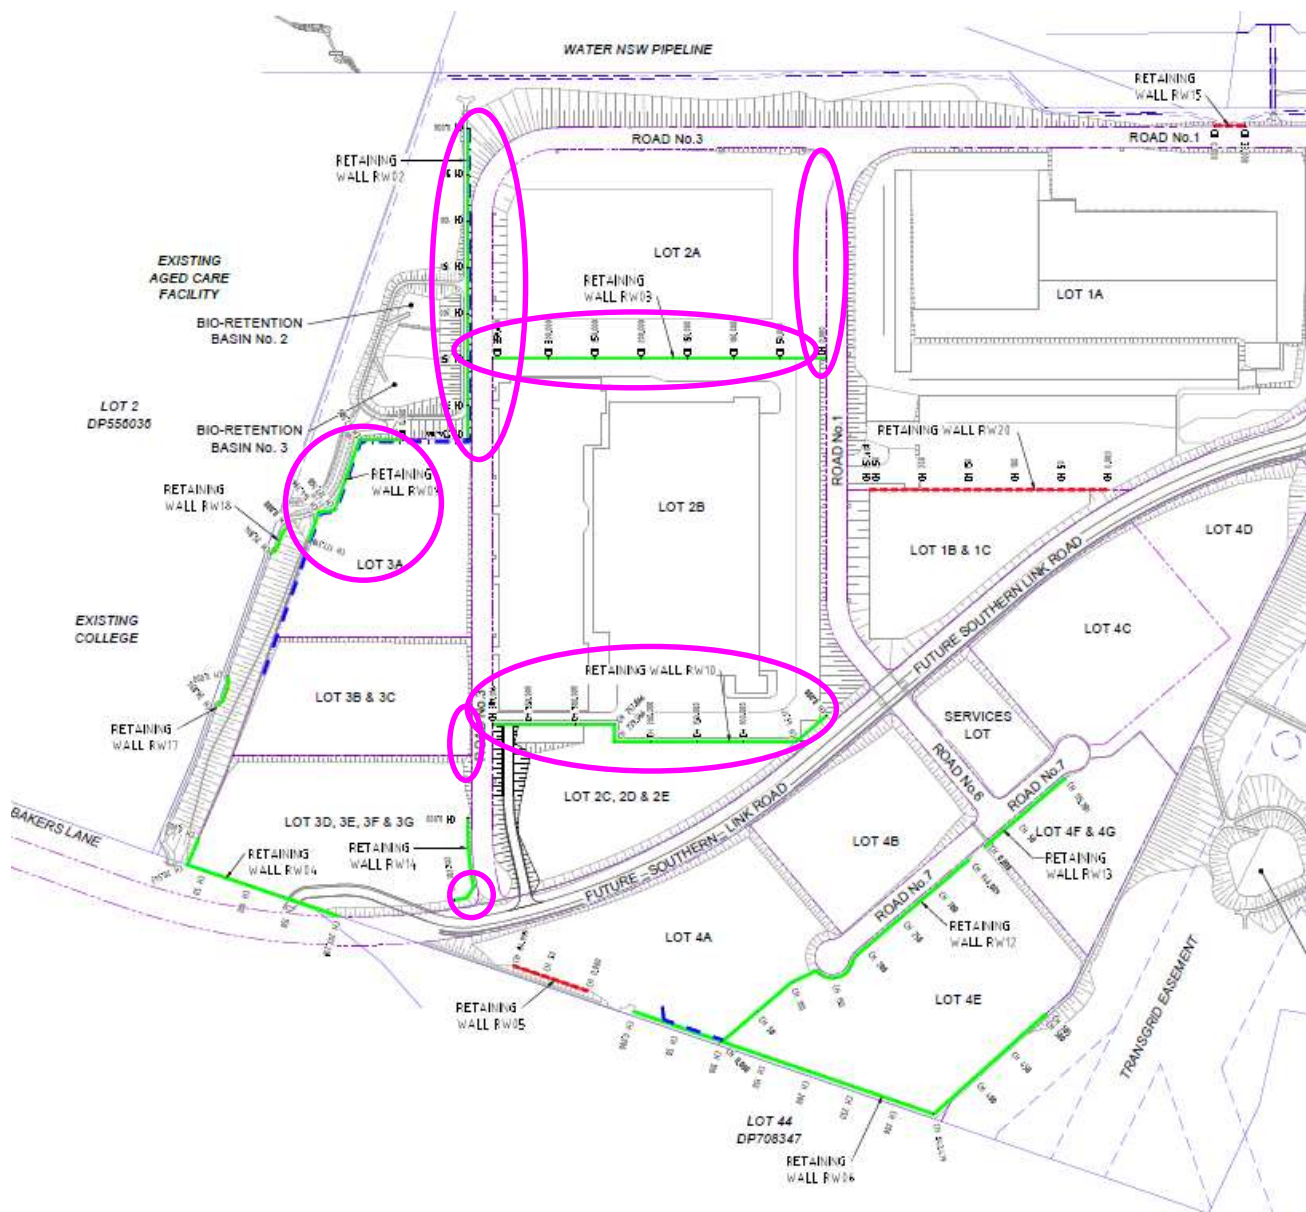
Changes to Retaining Wall Locations Proposed for Modification No. 3
